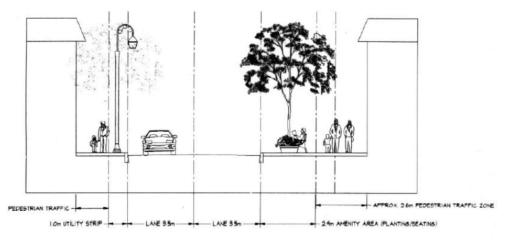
Cross section at the bulb out – Parking on one side of Mill Street
